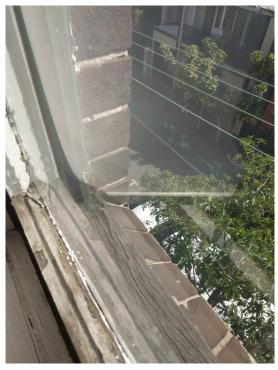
Window framing on northern side of second floor of 125-127 Little Eveleigh Street showing consistent sill and frame without cracks or crevices
